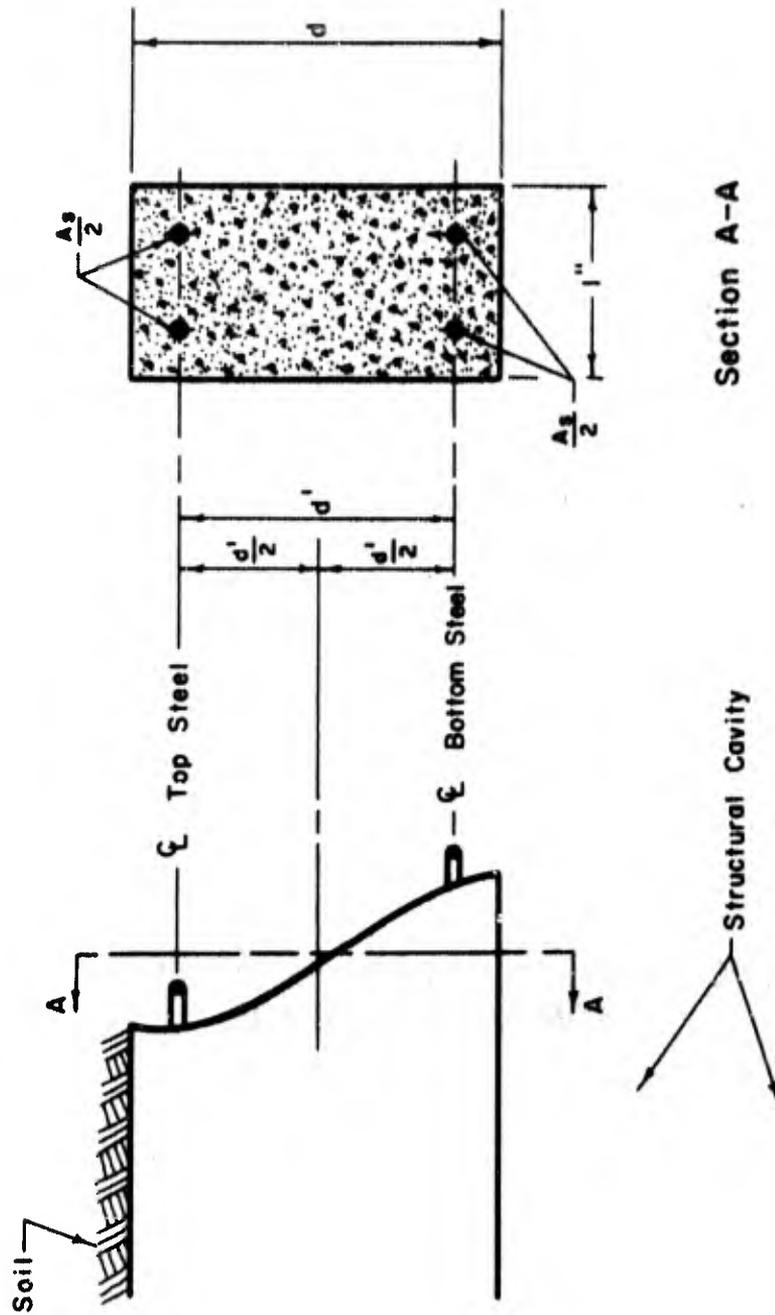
TYPICAL STRUCTURAL CROSS SECTION
